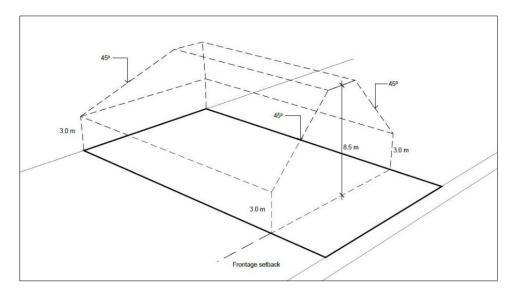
Building envelope as required by clause 8.4.2 A3(a) and clause 8.5.1 A2(a)
